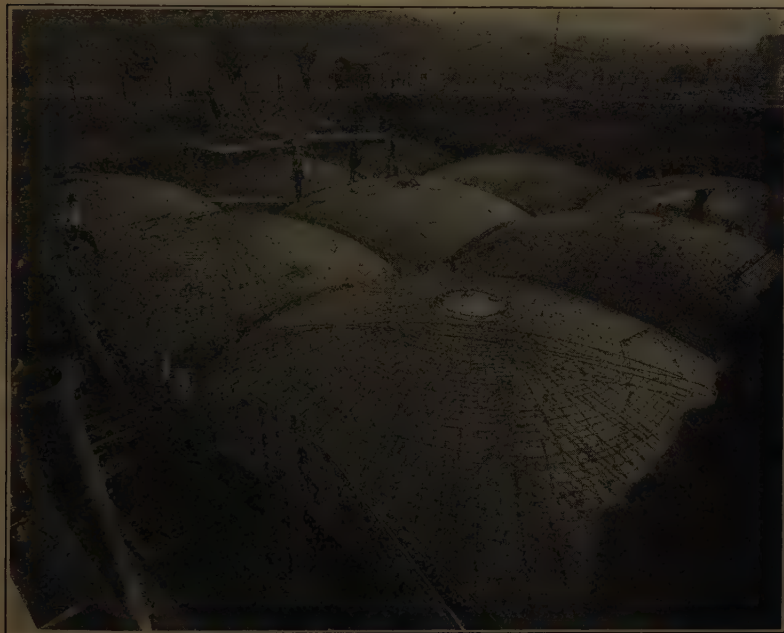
Construction for gas collection on Neustadt tanks, Stuttgart.
